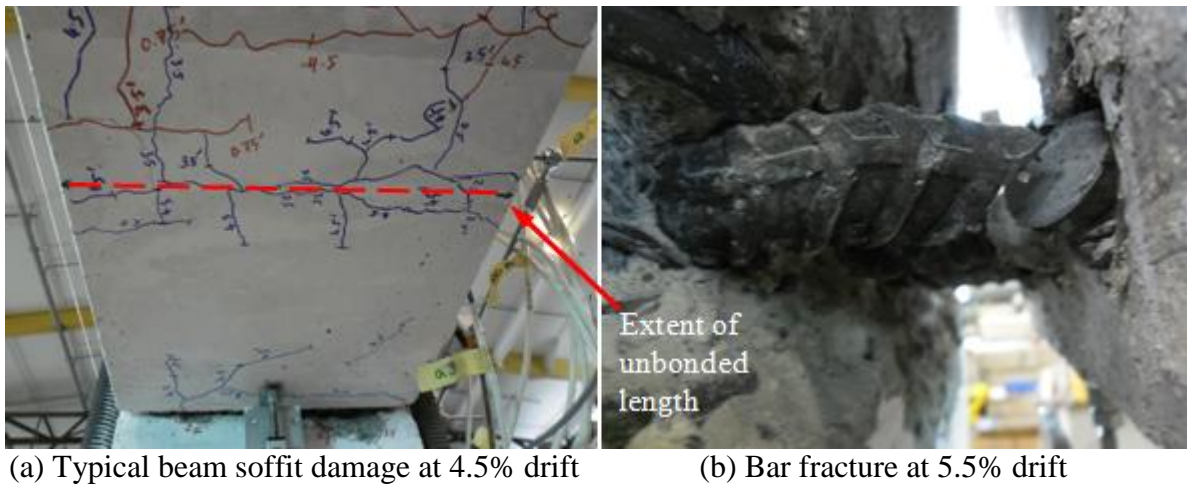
Beam soffit damage and bar fracture
